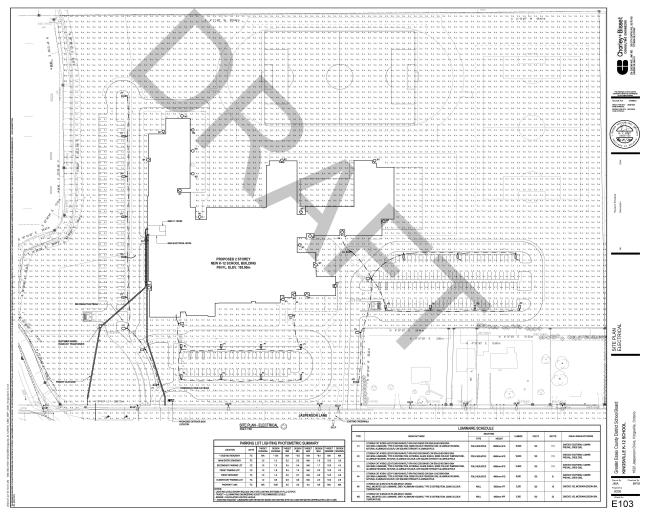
EXAMPLE OF LIGHTING PLAN
